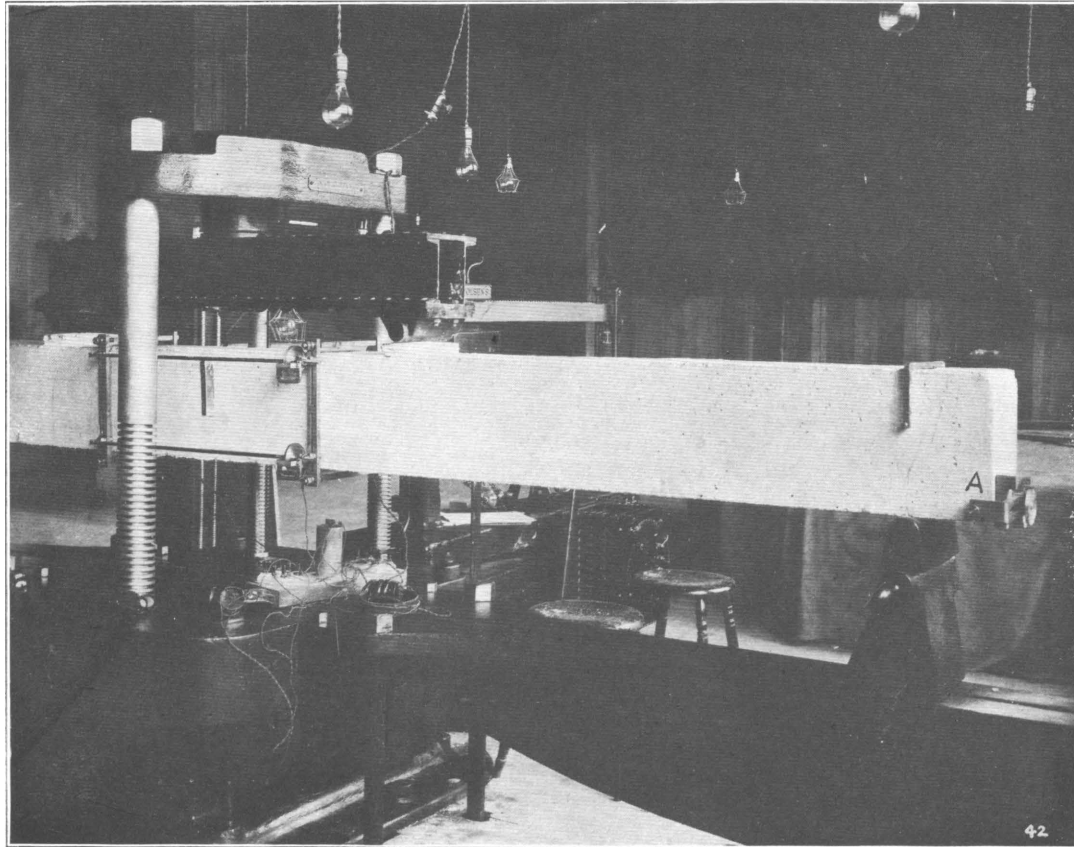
shows a reinforced beam under load with all the attachments. The construction of the box girder, through which the load is transmitted to the beam, and the deformer are fully described in Bulletin 329.<sup>8</sup> While the gauge length, 29.25 inches, was the same as that used in the tests on plain beams, the vertical spacing of the contact points was different, the upper point being 0.5 inch below the top, while the lower one was placed 1 inch above the bottom of the beam on the plane of the lower layer of reinforcement. By this arrangement the elongation of the reinforcement in the lower layer was read directly, no error due to the reduction of the readings from one horizontal plane to another being possible. The only source of error with this arrangement would be the irregularity in the vertical position of the reinforcement and on the assumption that the elongation read by the micrometers is the uniform lengthening of the reinforcement in the gauge length, uninfluenced by the incasing concrete and free of any comparatively large local elongations where the reinforcement spans a crack in the concrete.
